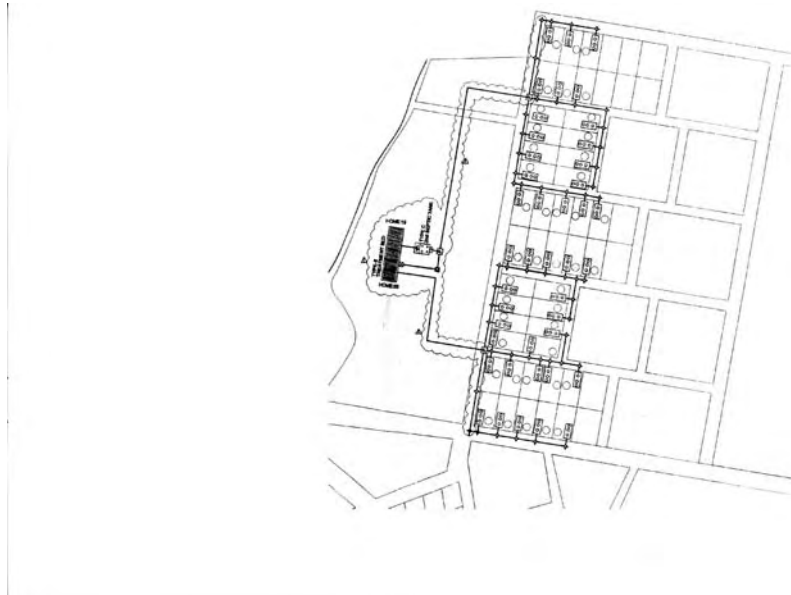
' Lay-out Plan of the Sewerage System in Ishdhoo/Kalaidhoo
